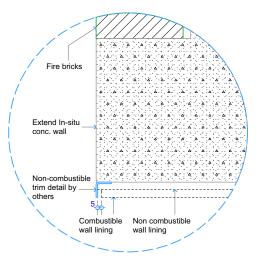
Plan View Fire Surround Opt. 7 Concrete Cavity
